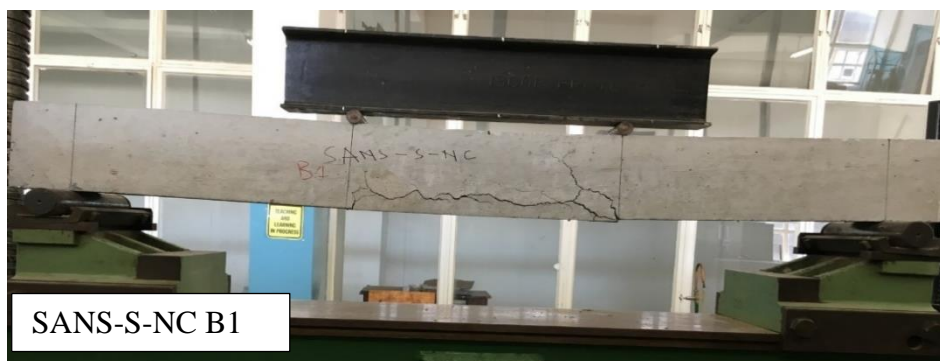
10: Flexural crack pattern developed on SANS 10100-NS-NC beams
